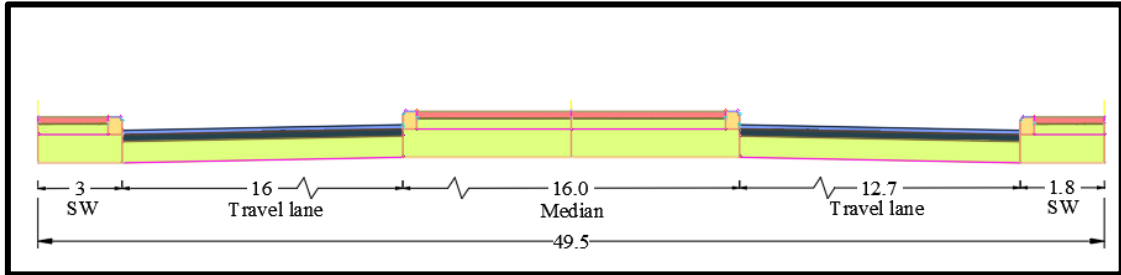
In Front Of Nablus Municipality Section No.4 Existing Cross Section.
